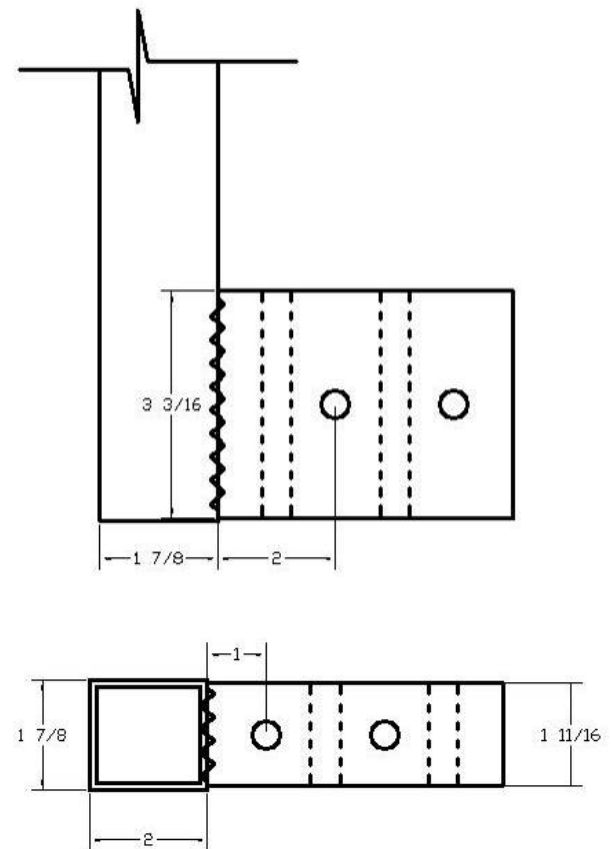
Connection box details for the bolted connections of the sill beams
